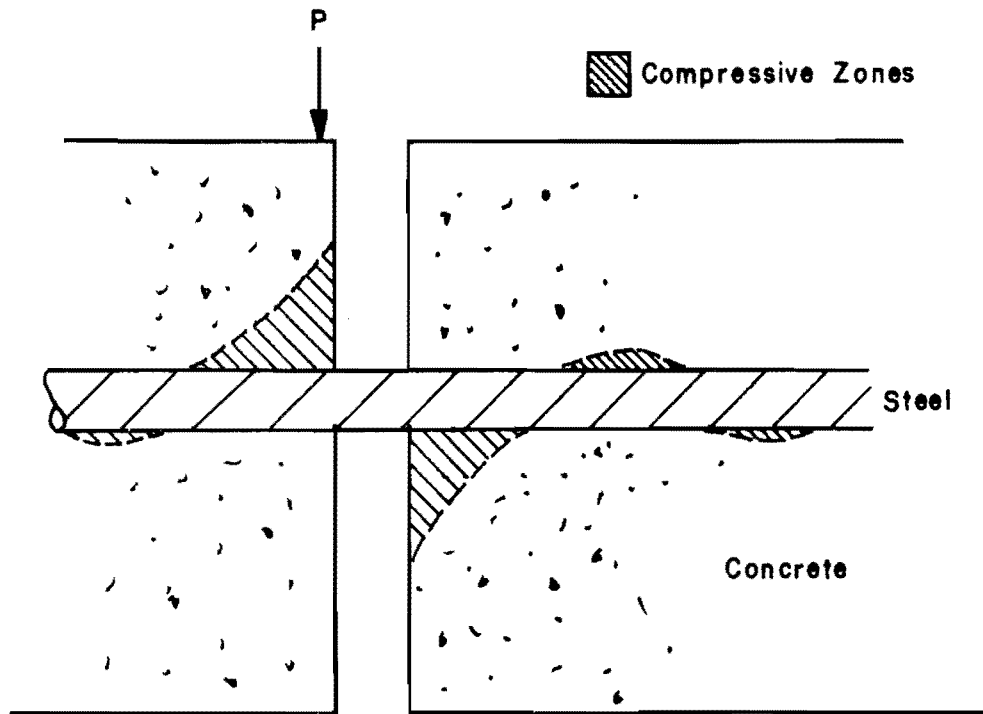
Bearing on the concrete underneath and above the steel reinforcement due to a load P .
